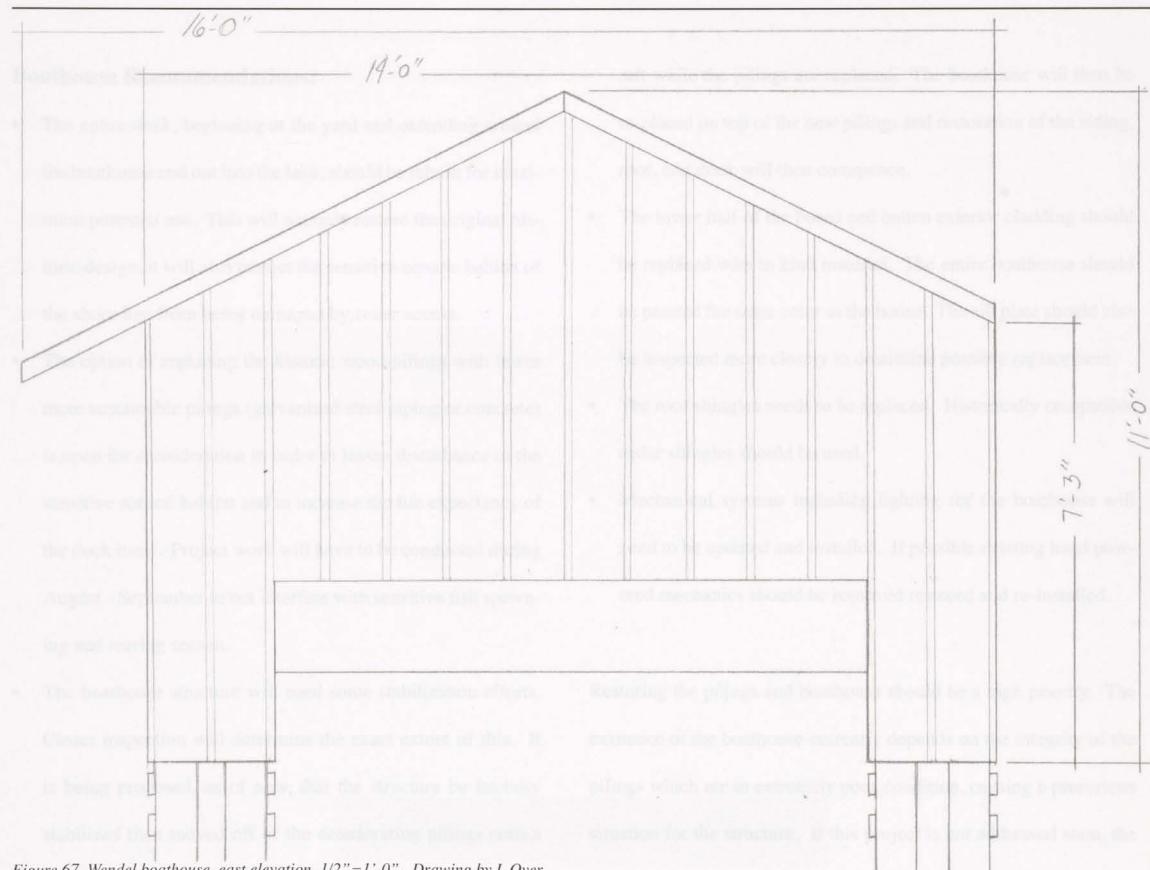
Wendel boathouse, east elevation, 1/2"=1'-0". Drawing by L.Over
